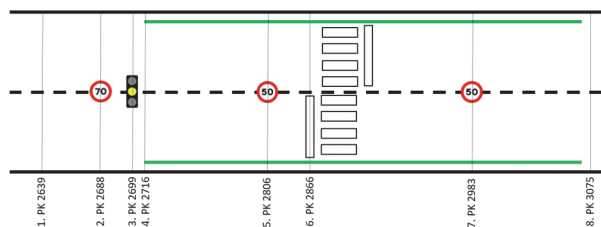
Detail of road design including the eight sections of interest. Example with green LSRM (Alt. 4)
